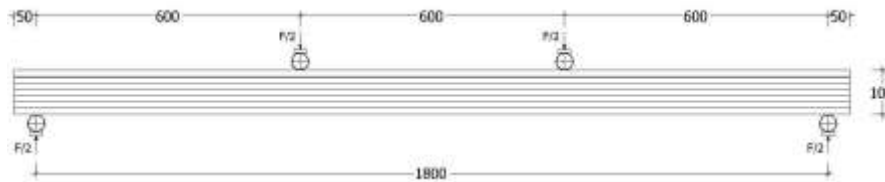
Test specimen perpendicular to the glue line (measurements in mm)
